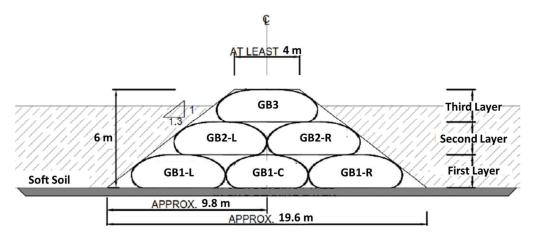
Schematic diagram of a stacked geotextile tubes containment bund in sectional view
